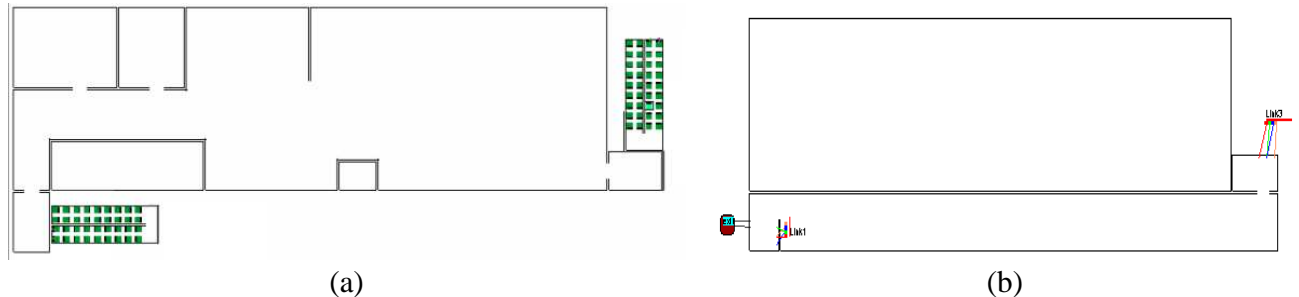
Layout of the building as used in buildingEXODUS for Scenario 1 to 4 showing (a) first floor and (b) ground floor
